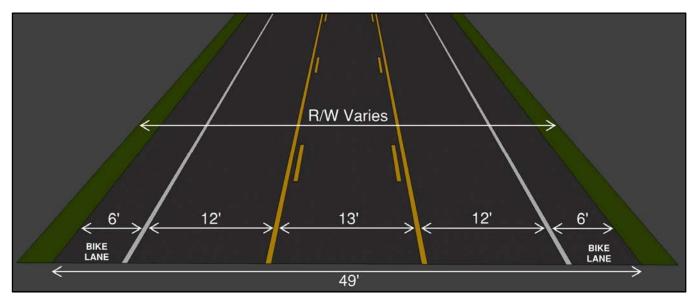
Oakland Avenue (West) Proposed Typical Section
